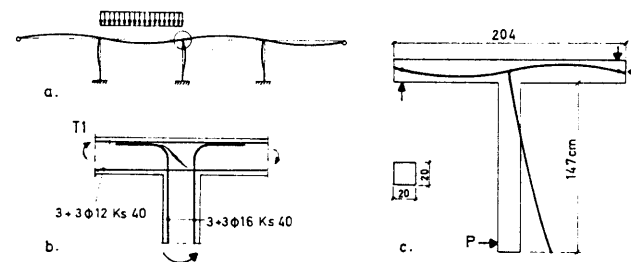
(a).—Deflected Shape of Bridge with Load on One Span; (b) Reinforcement of T-Joint According to Earlier Practice; (c) Dimensions and Method of Loading of Test Specimen (1 in. = 25.4 mm)
